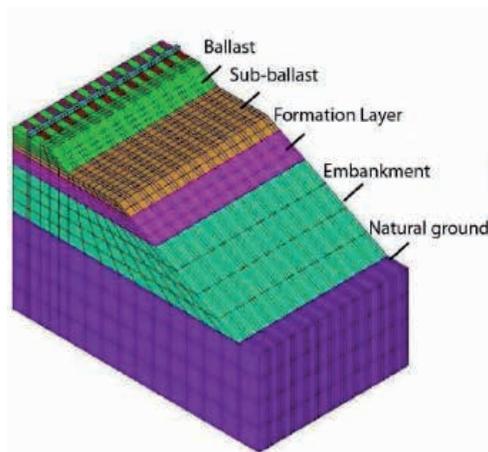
Finite element models for the proposed sections. Source: Gallego et al, 2016.
